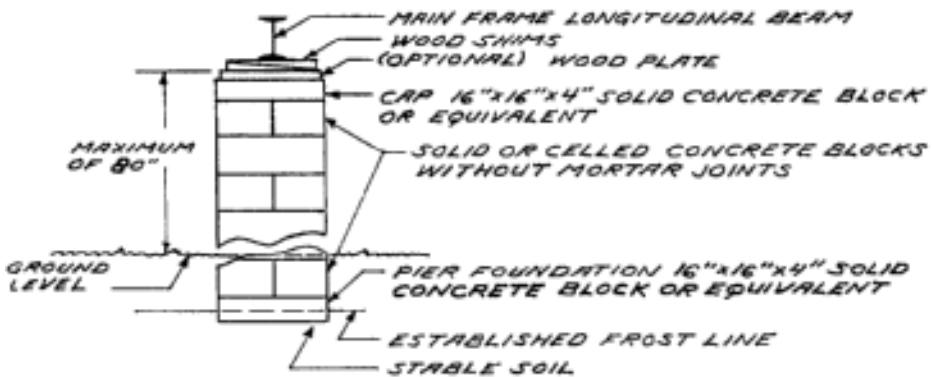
PIERS OVER 40" IN HEIGHT AND NOT EXCEEDING 80" IN HEIGHT (DOUBLE BLOCK CONSTRUCTION)
